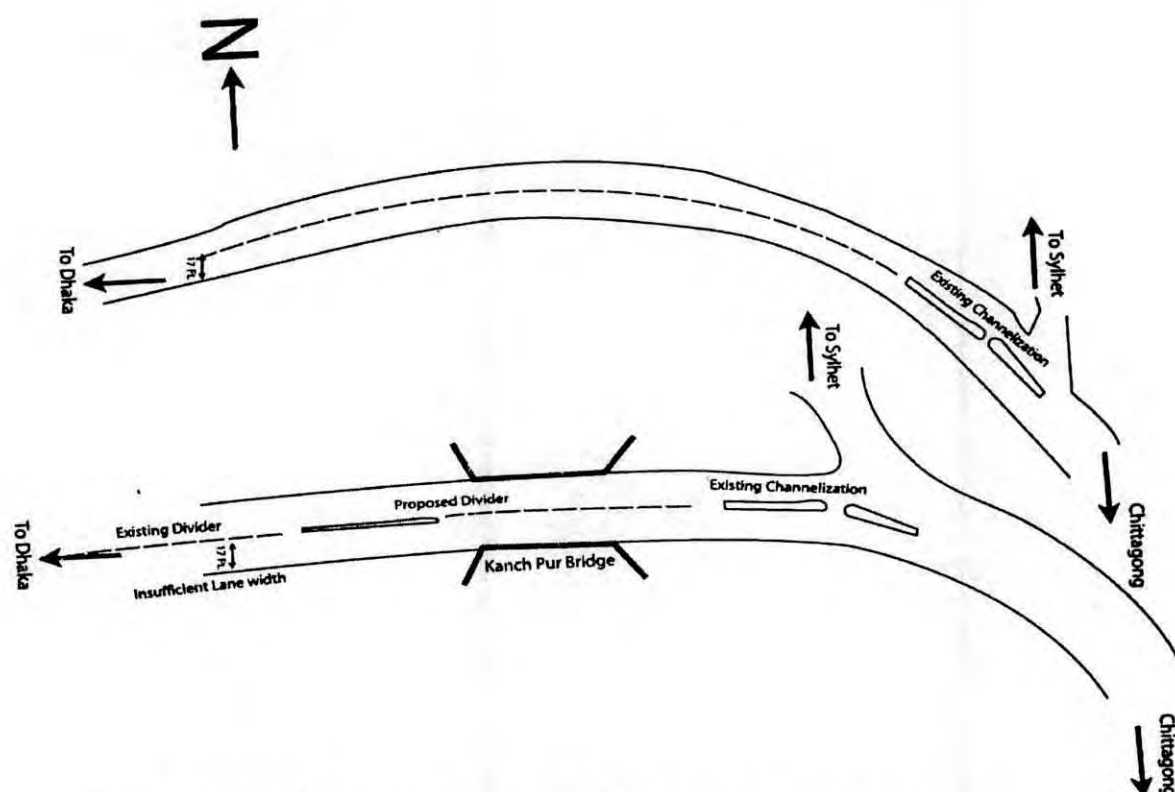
Proposed Layout of Kanchpur Bridge Approach
